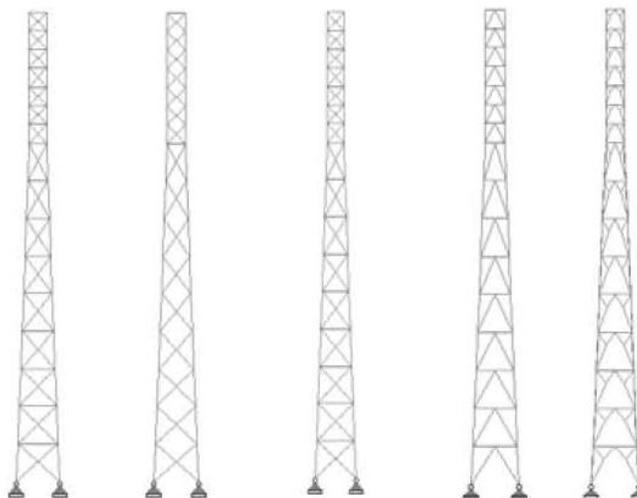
Models of 164 ft. (50m) Towers with different Bracing Systems (Jesumi and Rajendran, 2013)
